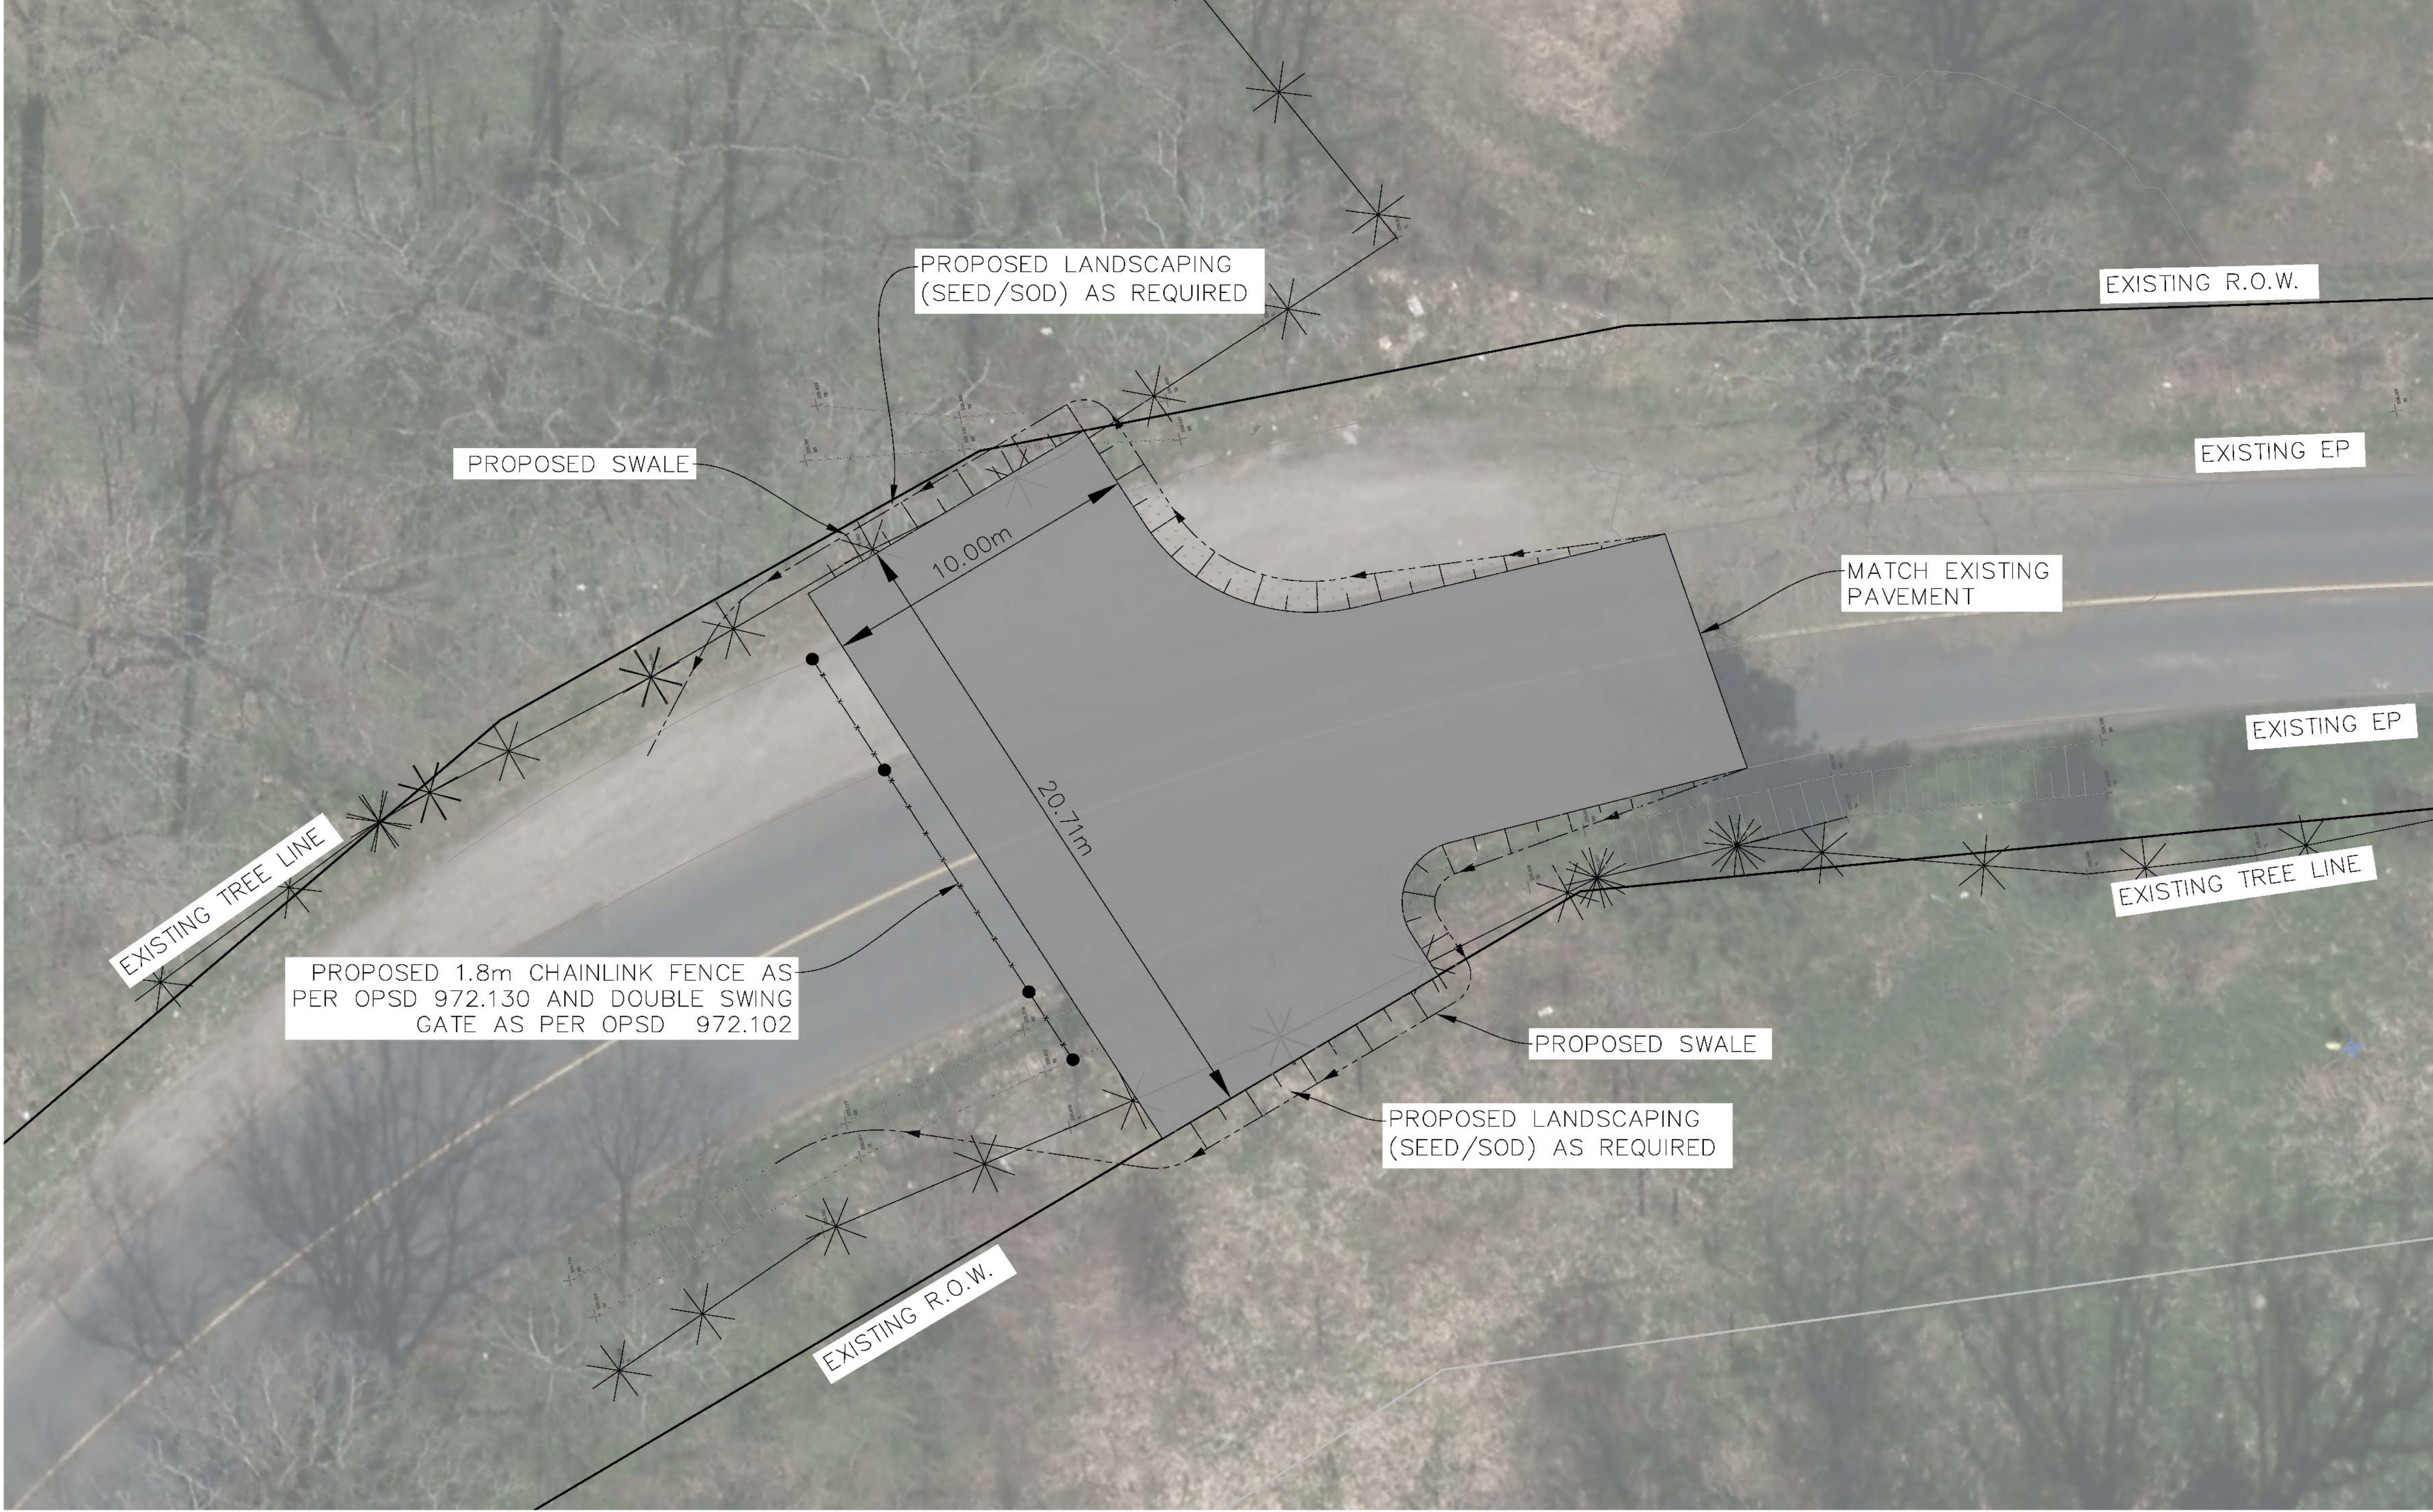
Proposed Hammerhead Turnaround (Plan View)
